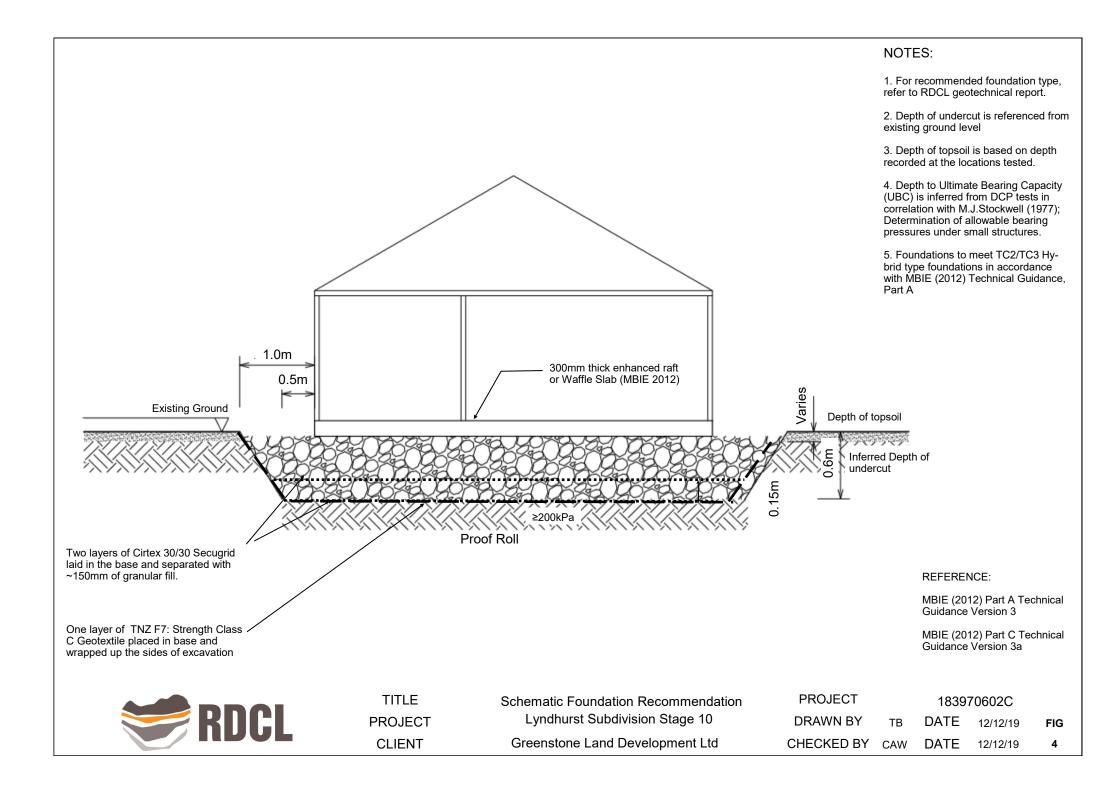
SCHEMATIC FOUNDATION RECOMMENDATIONS
